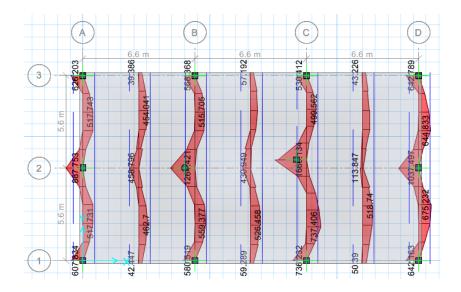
Along shorter side reinforcement(SAFE:IS, with staggered column)
